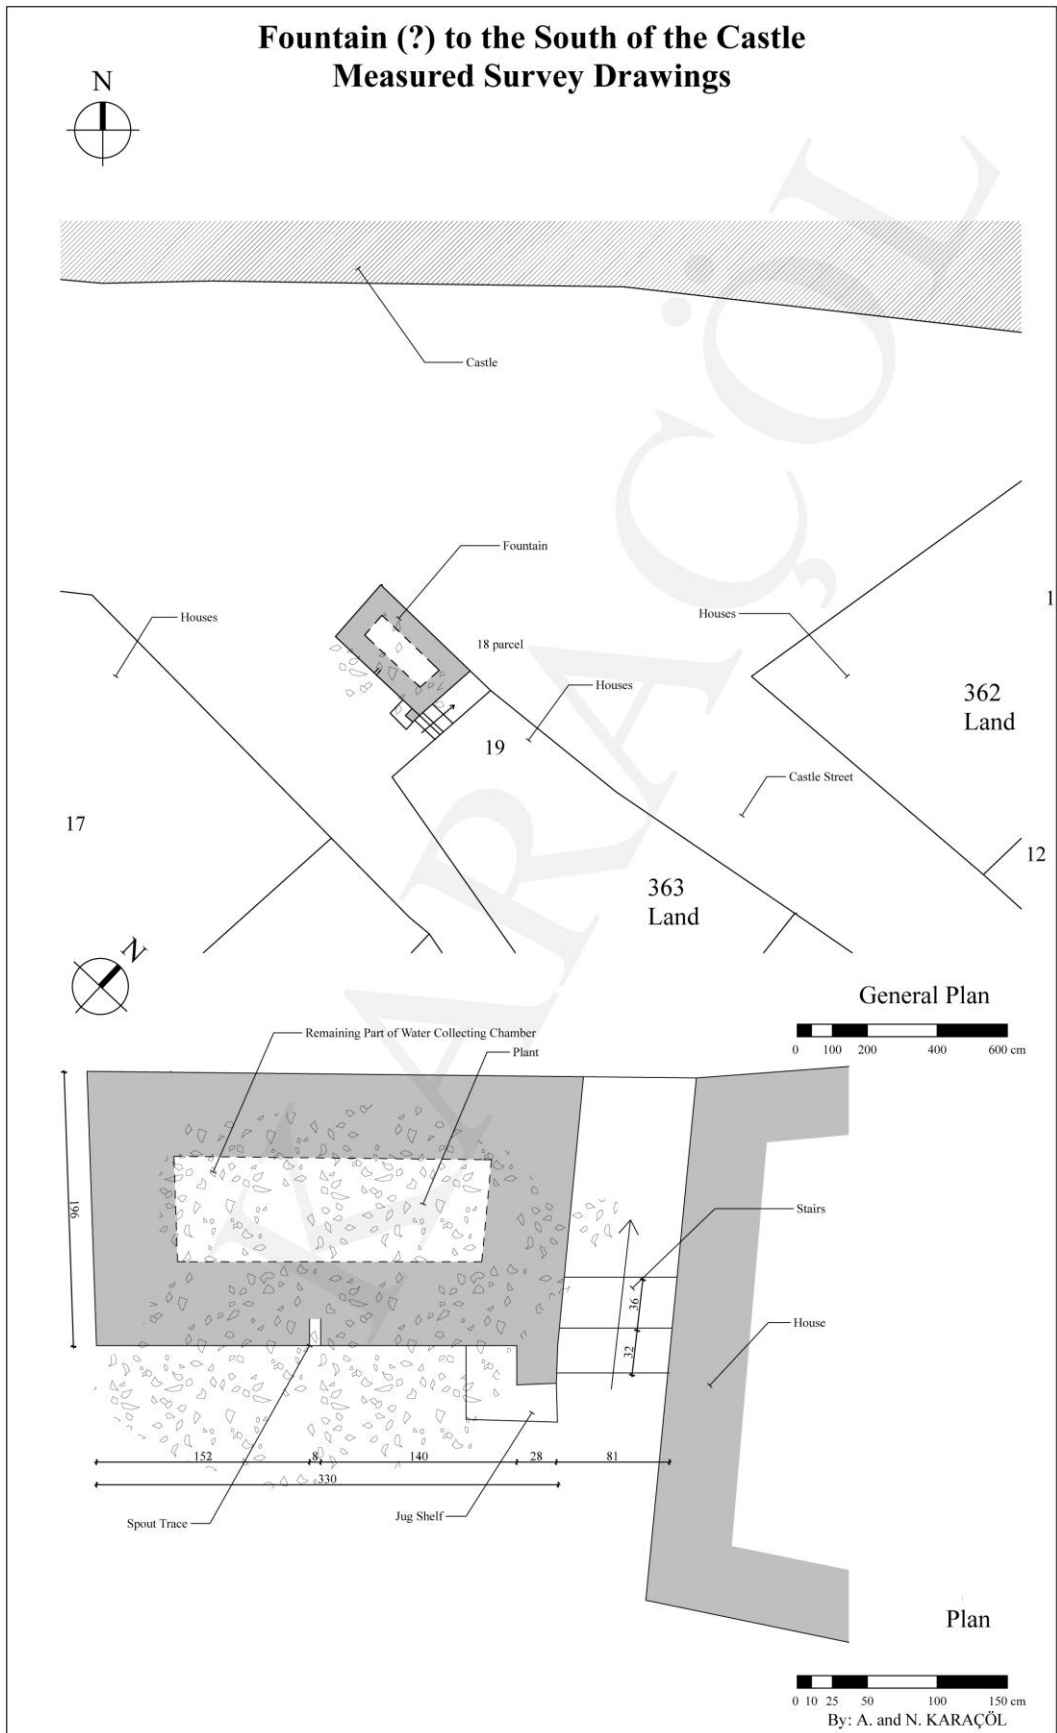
Fountain to the south of the Castle site plan and plan drawings
